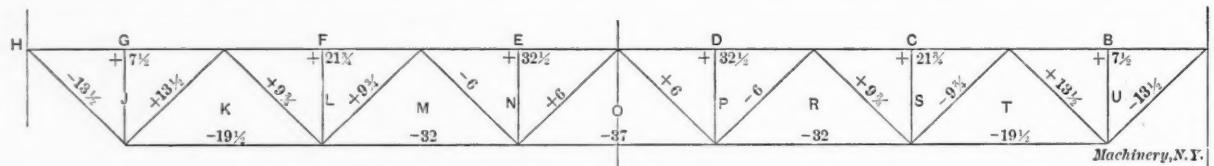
Stresses in Crane Girder in Fig. 31, as determined by Stress Diagrams
